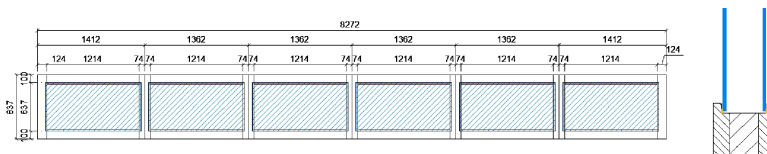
Side-view of hybrid timber-glass beam (left) and detail of cross-section (right) [40].
